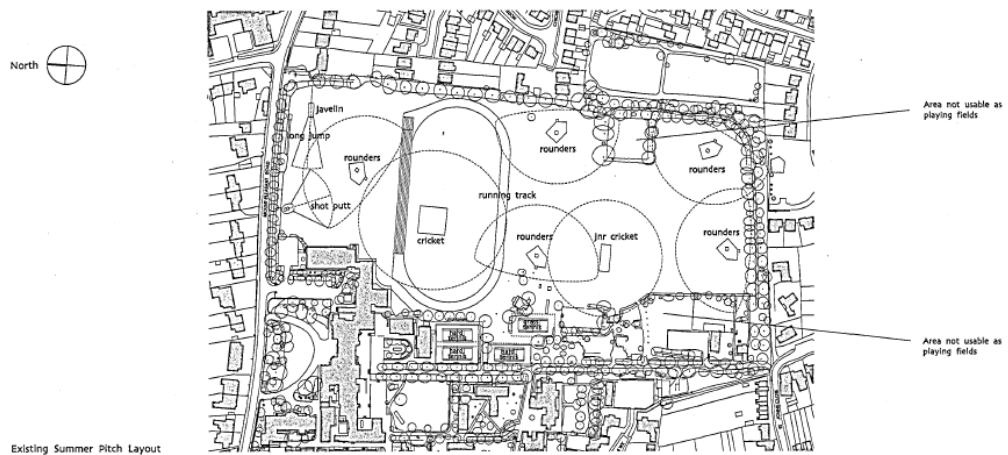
Existing Summer pitch layout for the refused 2007 planning application
